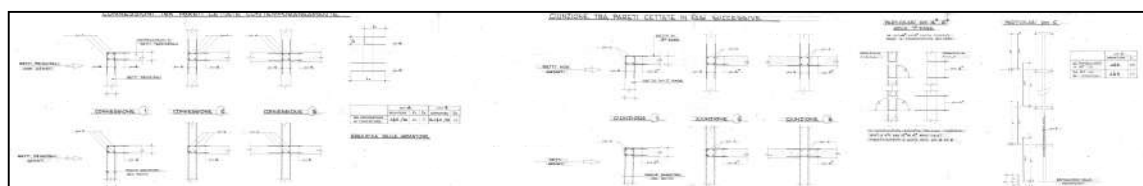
Intersections between walls. (F106.2T33_STRUCTURAL).
